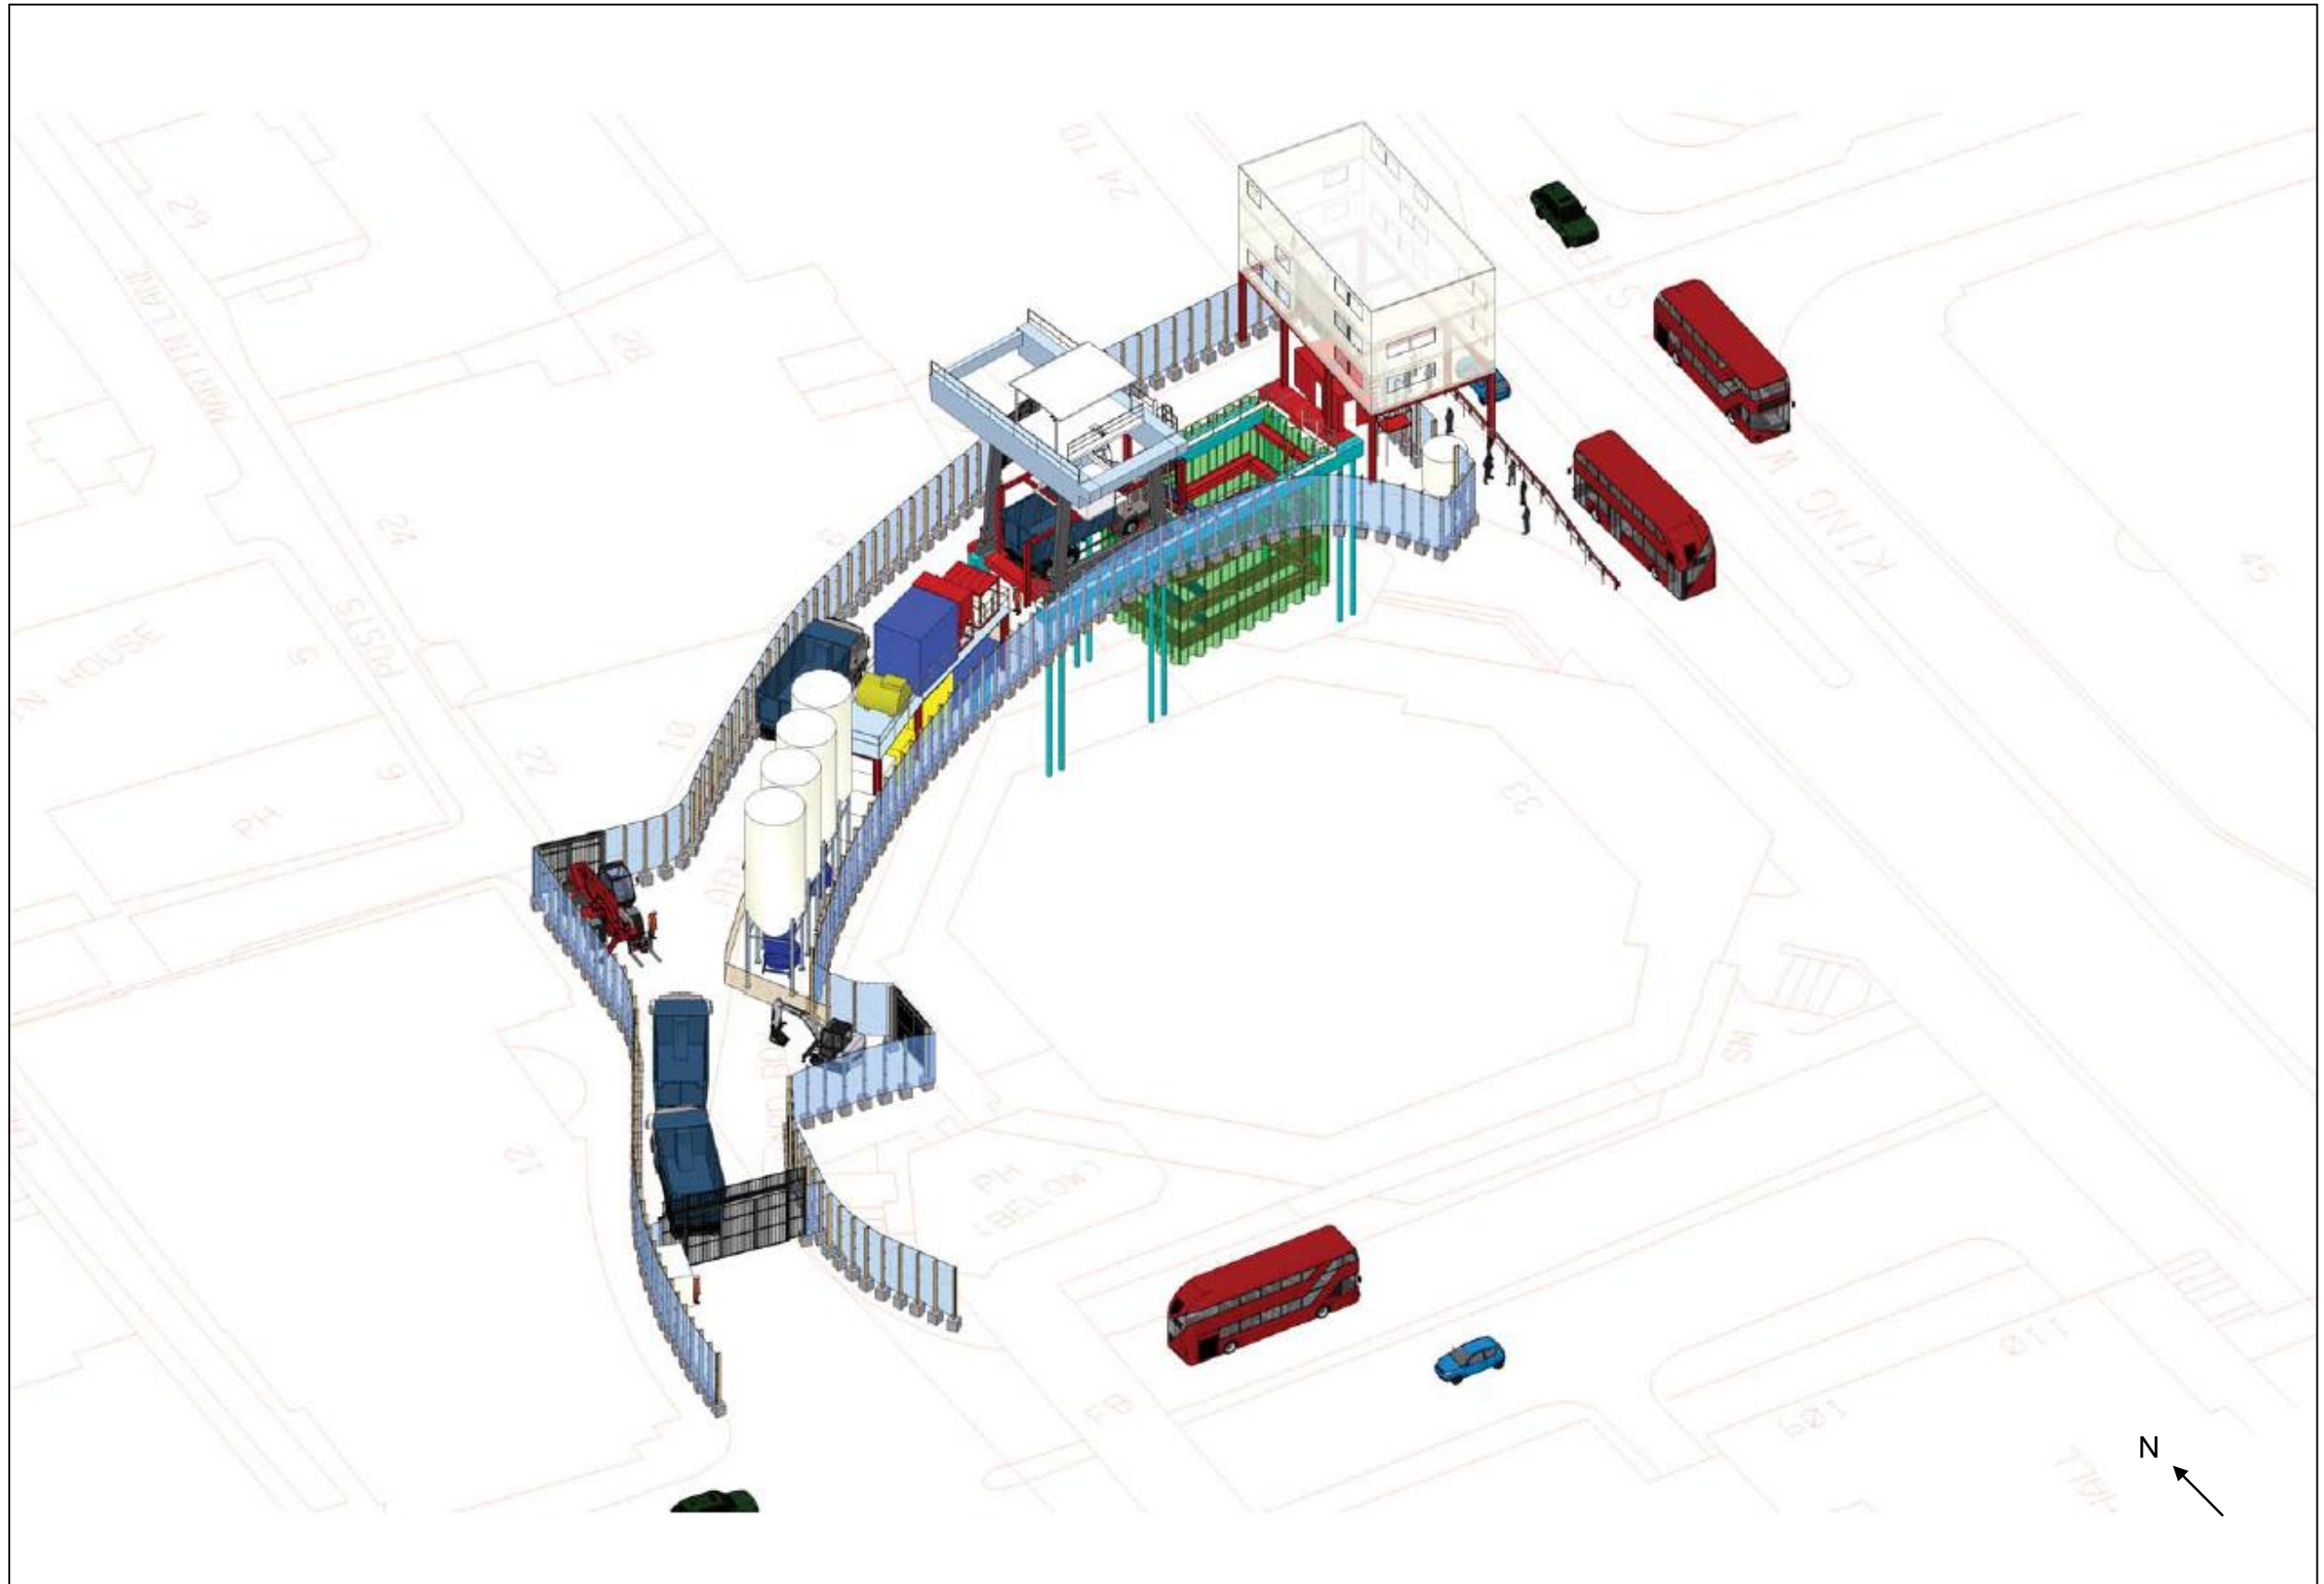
Indicative Arthur Street Work Site 3D View
